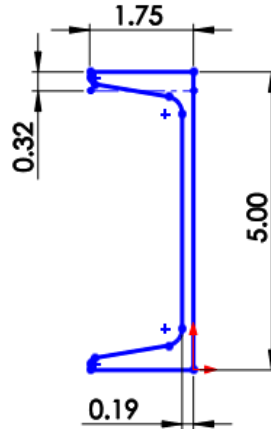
Cross-Section of the 5x6.7 C-channel Steel Structure Beam
